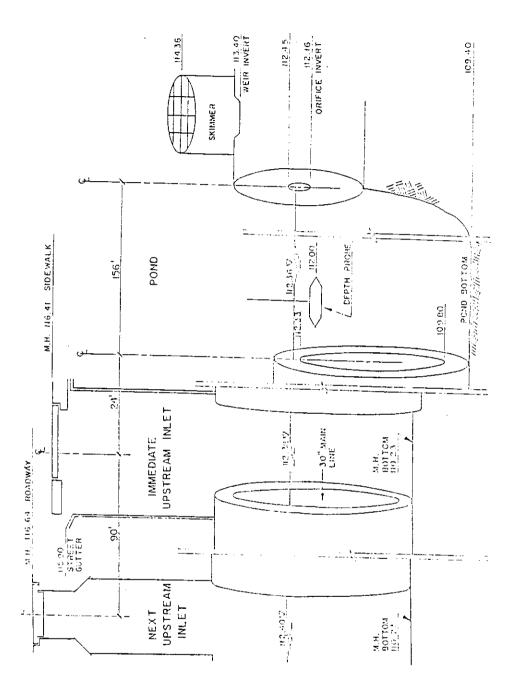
Pond and Sewer System Hydraulic Profile for the Residential Site.
